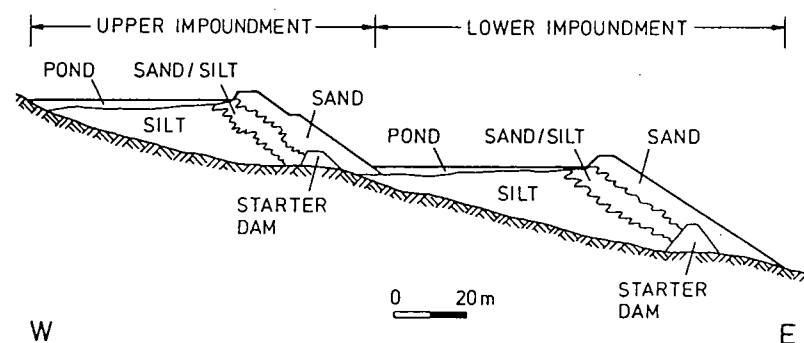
Cross Section Through the Prestaval Tailings Dams (from Berti, et al., 1988)
